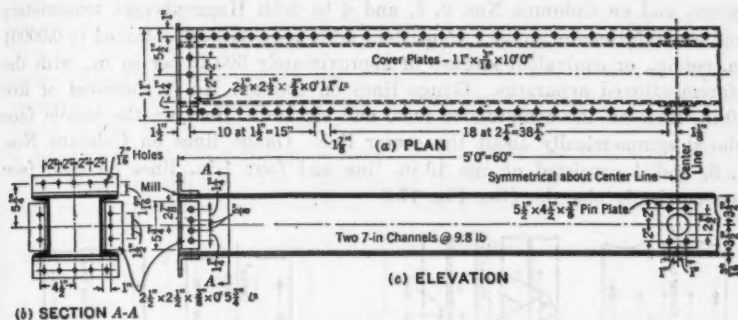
DETAILS AND DIMENSIONS, COLUMN NO. 3.
